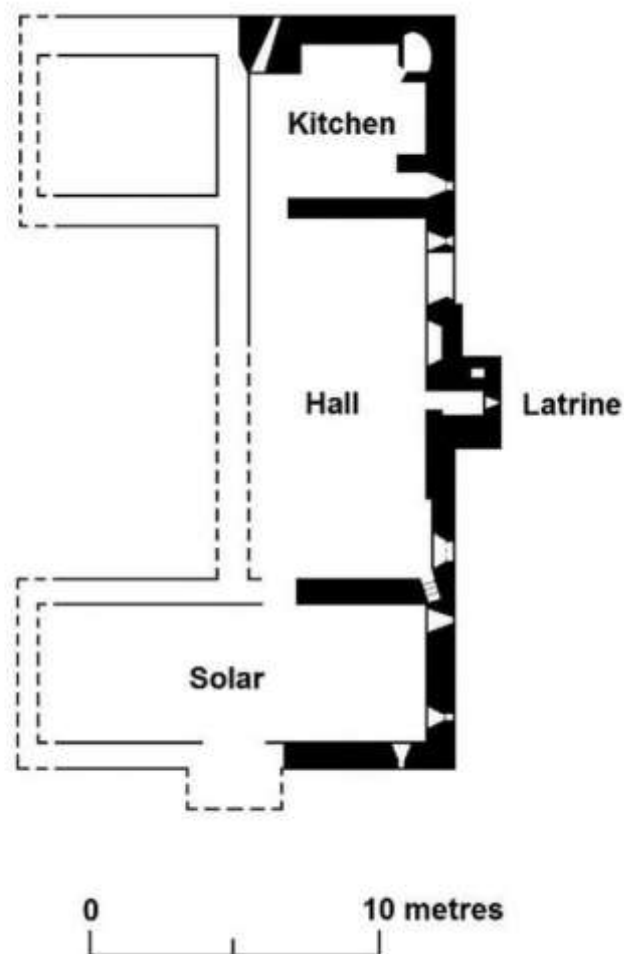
Plan of Penallt, Carms., at first floor level (redrawn from Davis 1989).
